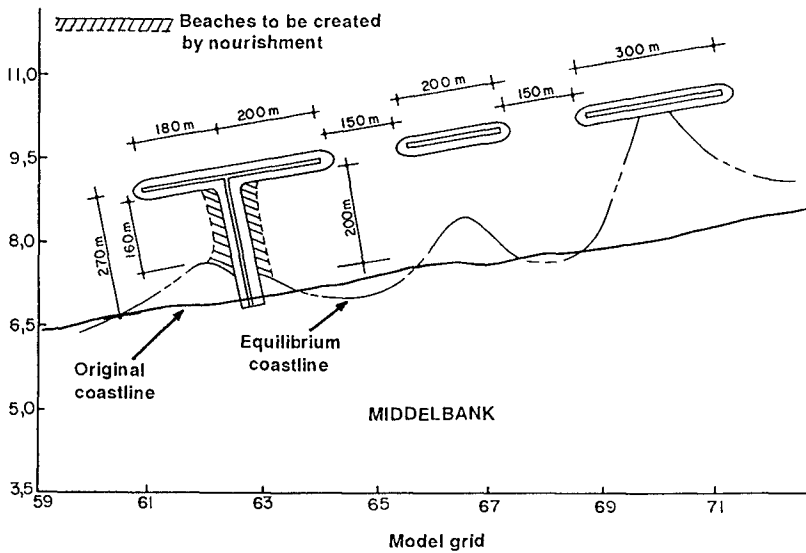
A PROPOSED LAYOUT AT MIDDELBANK
